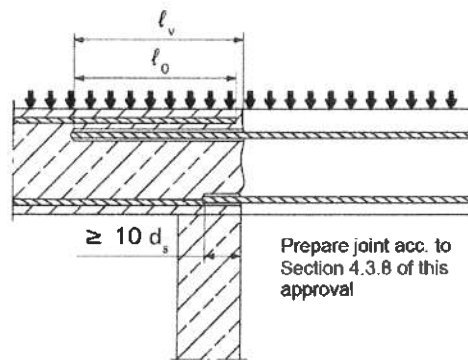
Overlapping joint at a foundation of a wall or column where the rebars are stressed in tension
